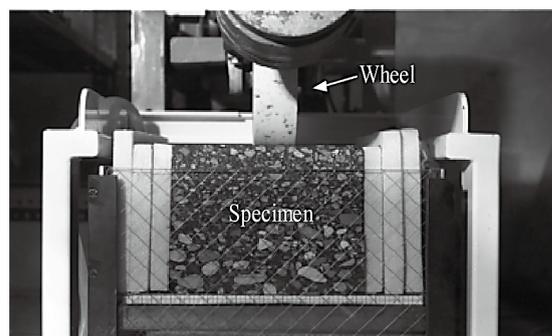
Slab under Repeated Loading in the Hokkaido Wheel Tracking Test (HWTT)
